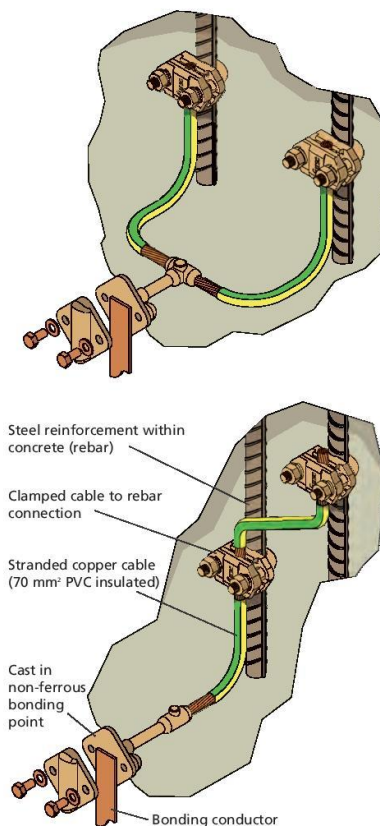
Typical methods of bonding to steel reinforcement within concrete
